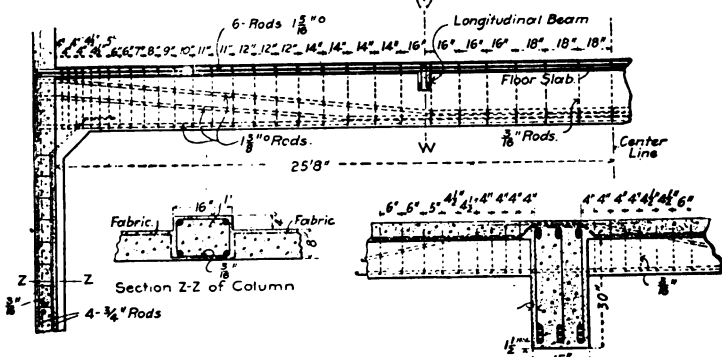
Roof Girder, Central Felt and Paper Co.'s Factory.
